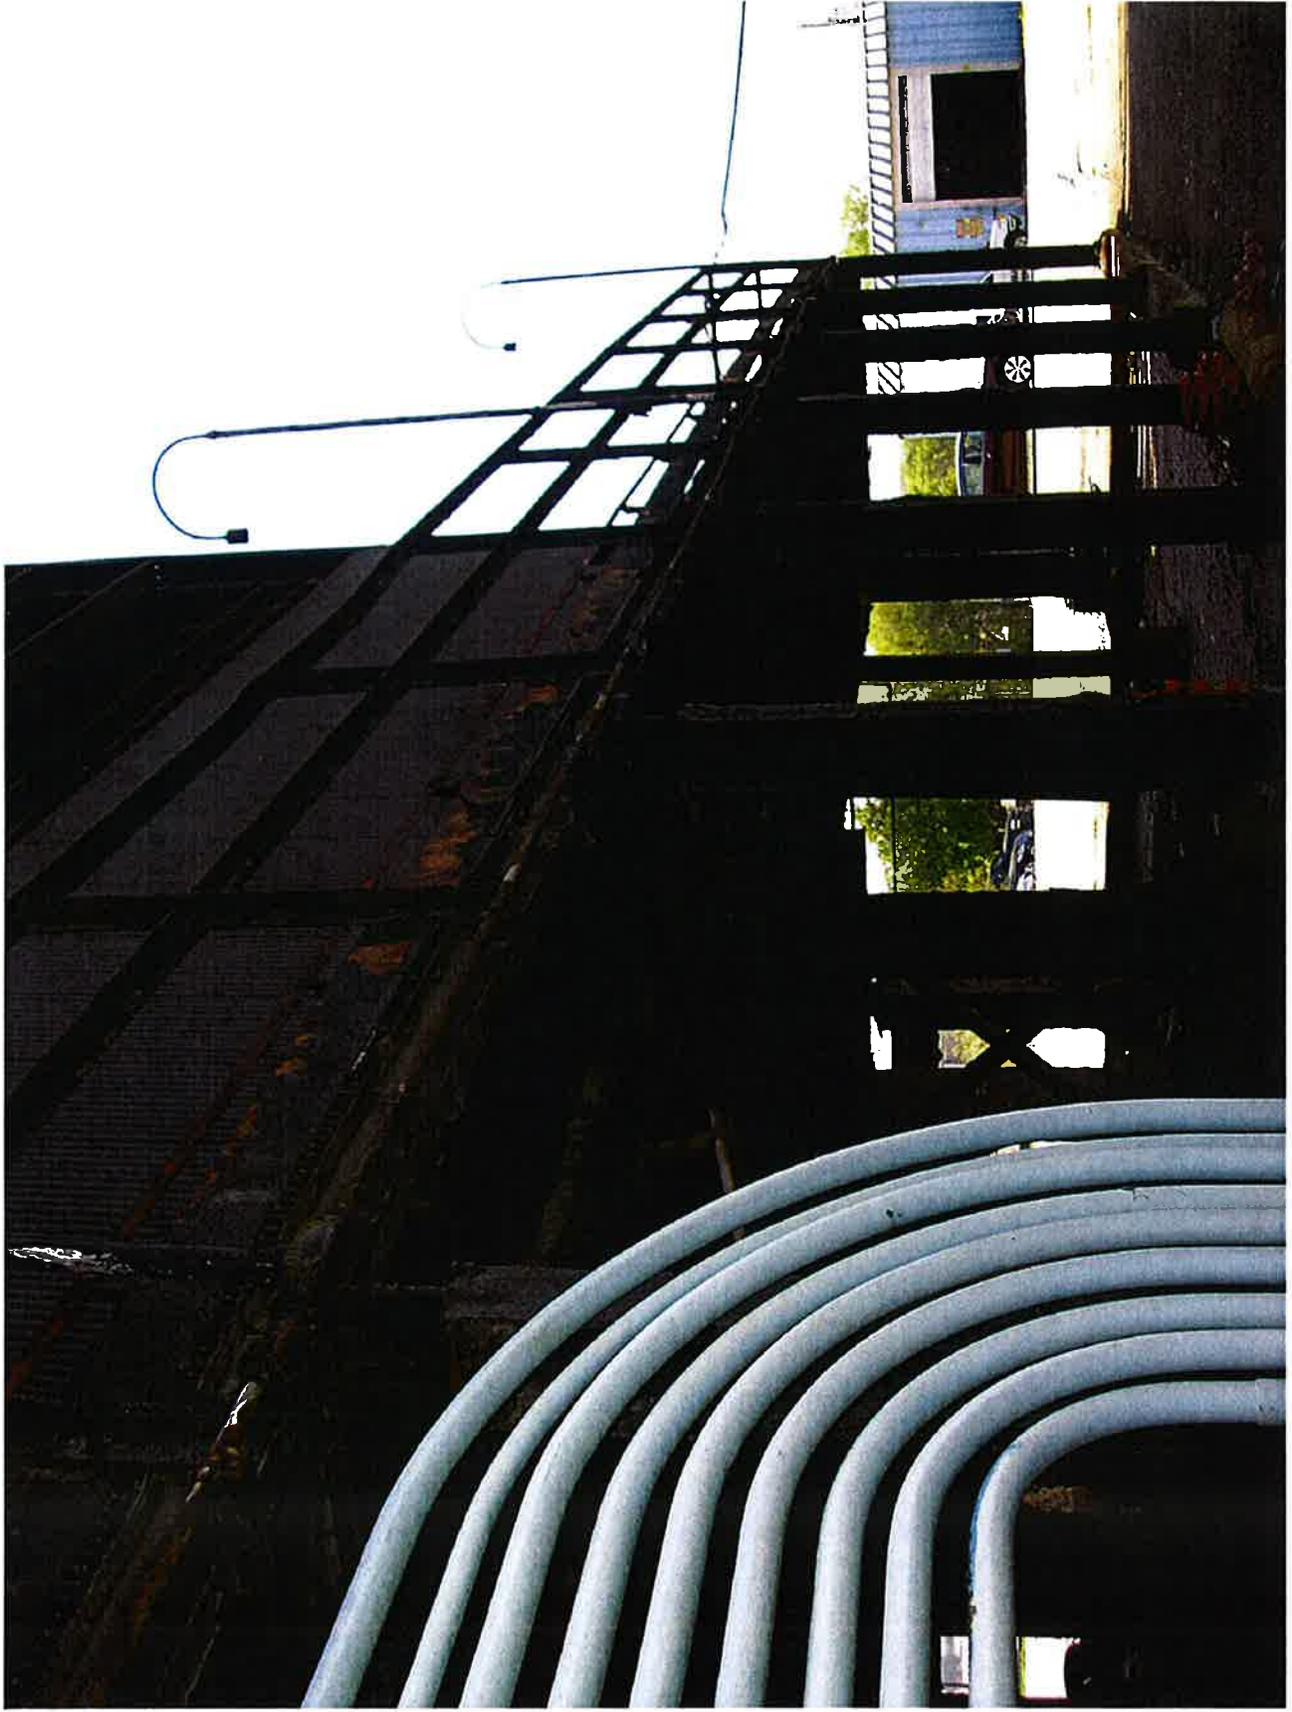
VIEW OF CATWALK AT WEST ELEVATION OF BUILDING 16
